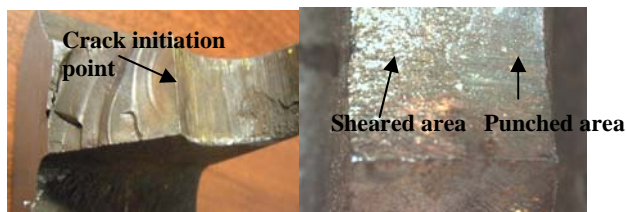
Crack Initiated from Middle Depth of Bolt Hole
